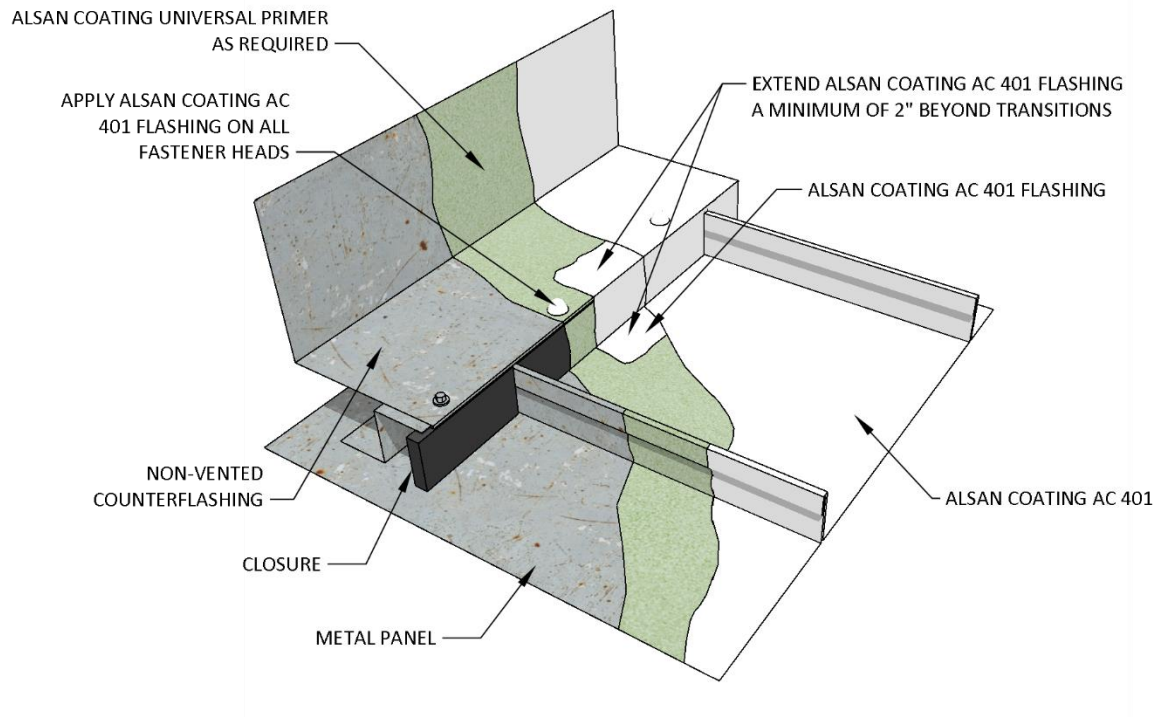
Acrylic Roof Coating Over Standing Seam Metal, Wall/Curb
